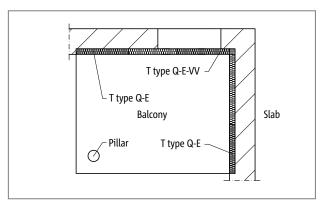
Schöck Isokorb® T type Q-E, Q-E-VV: Balcony supported on two sides with pillar and positive shear forces
